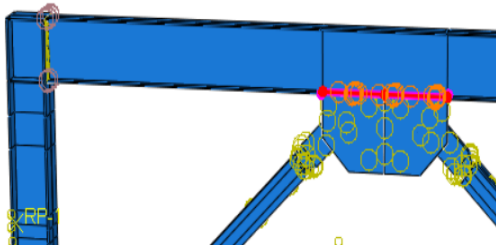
Connection of Central Reinforcer to the Central Beam with Tie Constraint.
